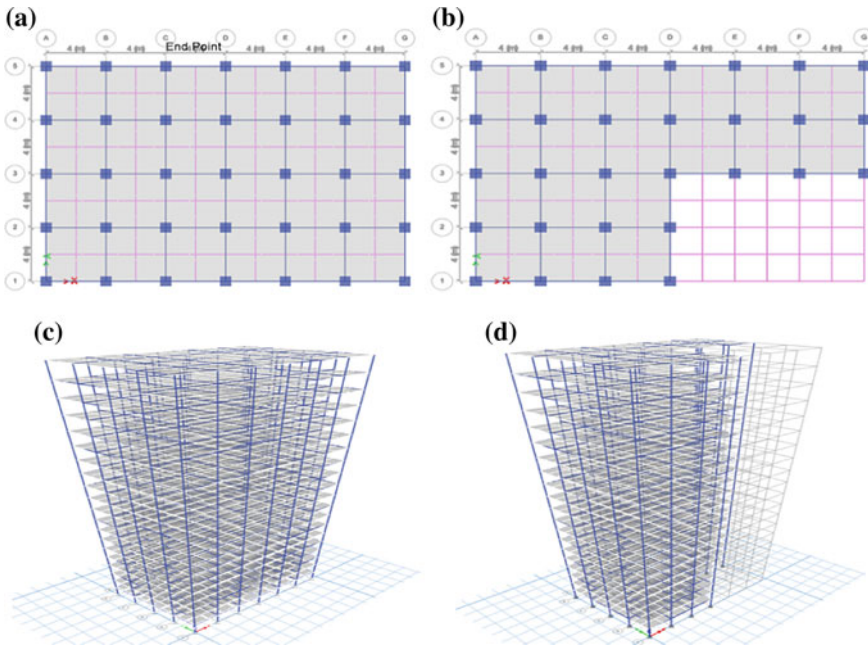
a Plan of regular RCC building, b Plan of irregular RCC building, c 3D view of regular RCC building, d 3D view of irregular RCC building
